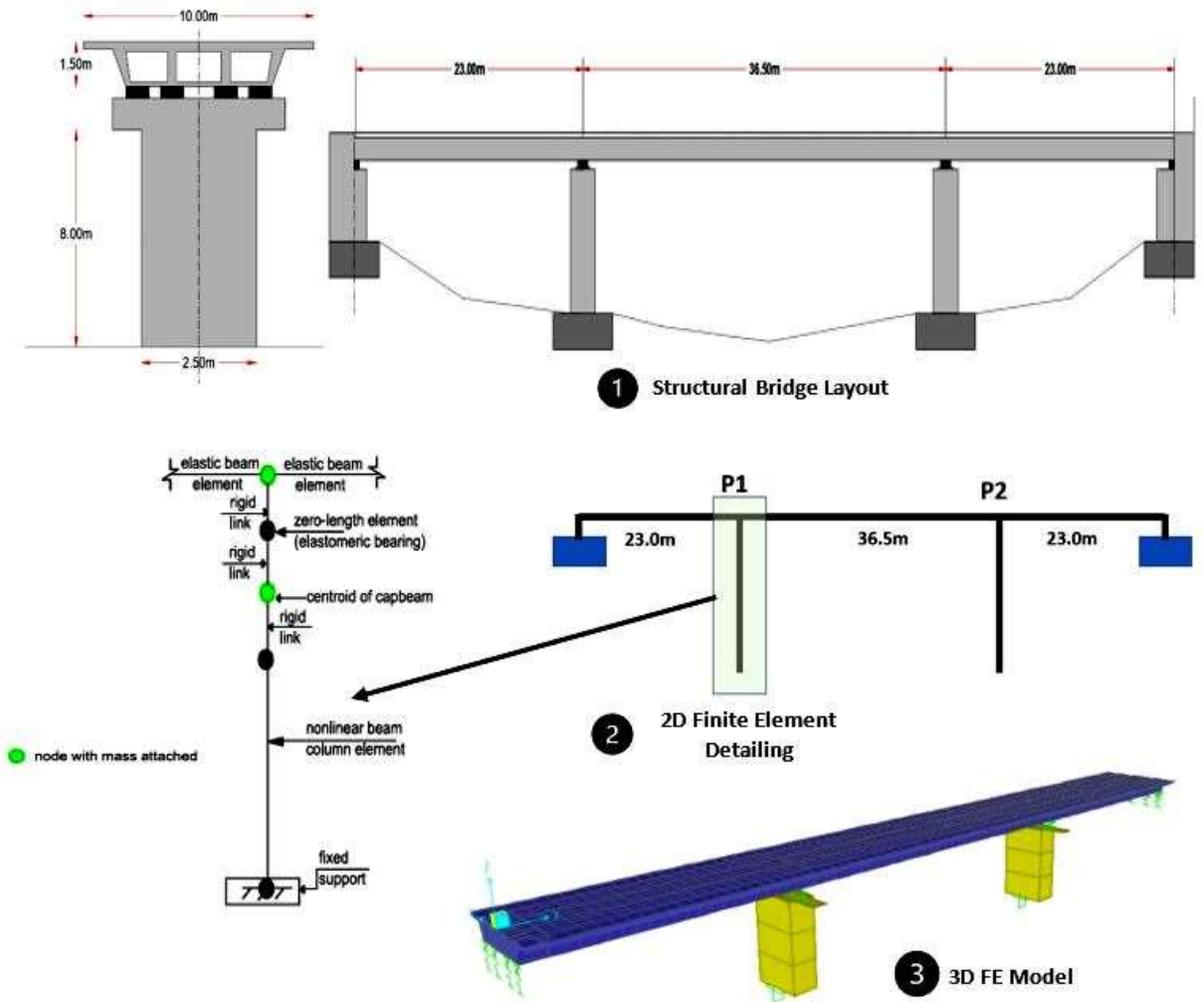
Bridge 3D Model using Finite Element Software, and its sectional views.
